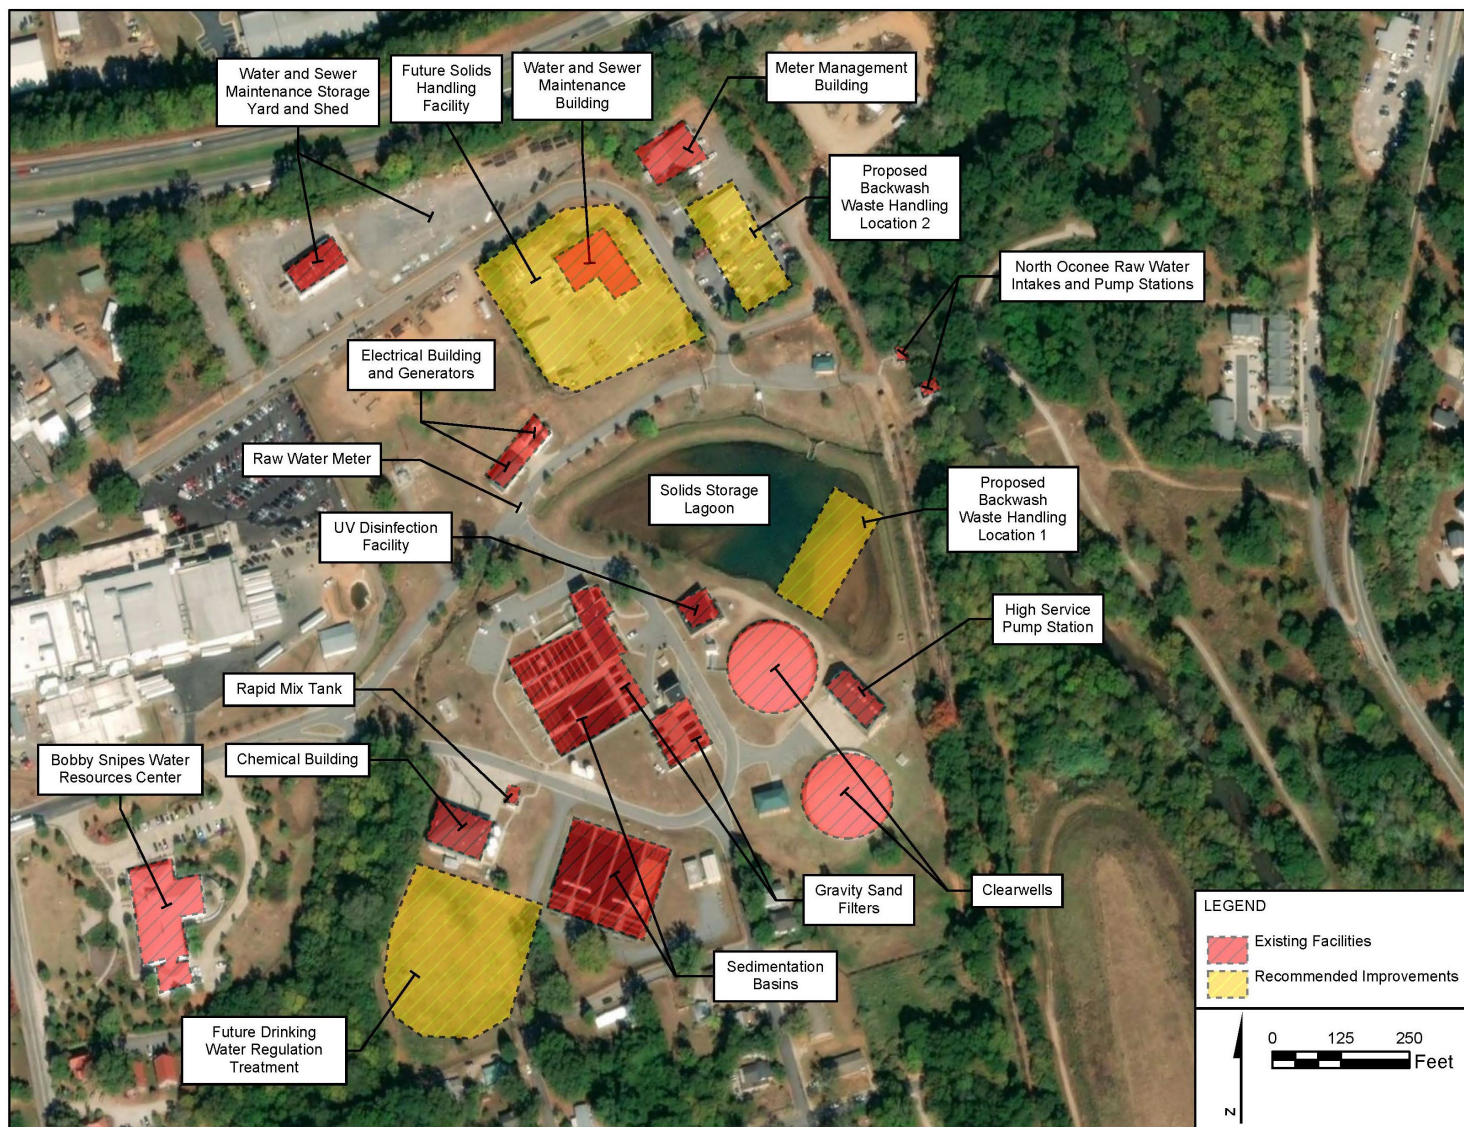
J.G. Beacham Water Treatment Plant Site Plan
